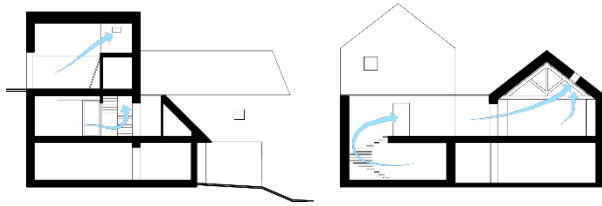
Family House Jinonice - ventilation schema in section (1:500) (source: author)
